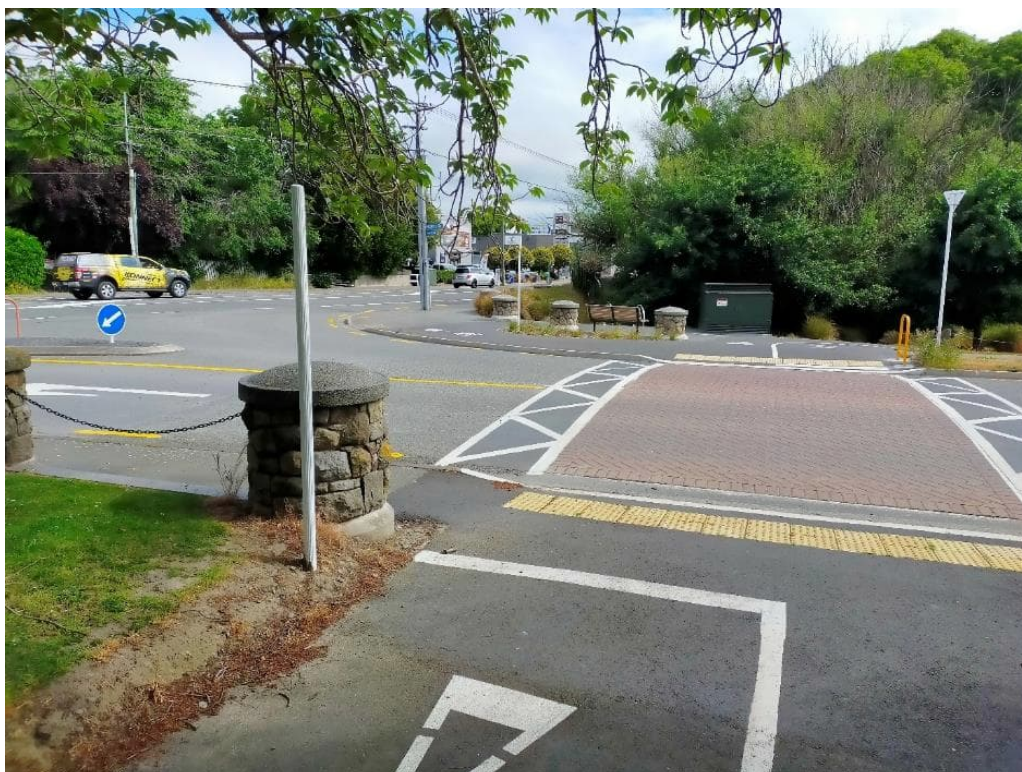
Missing give-way sign at MCR crossing of Annex Road
